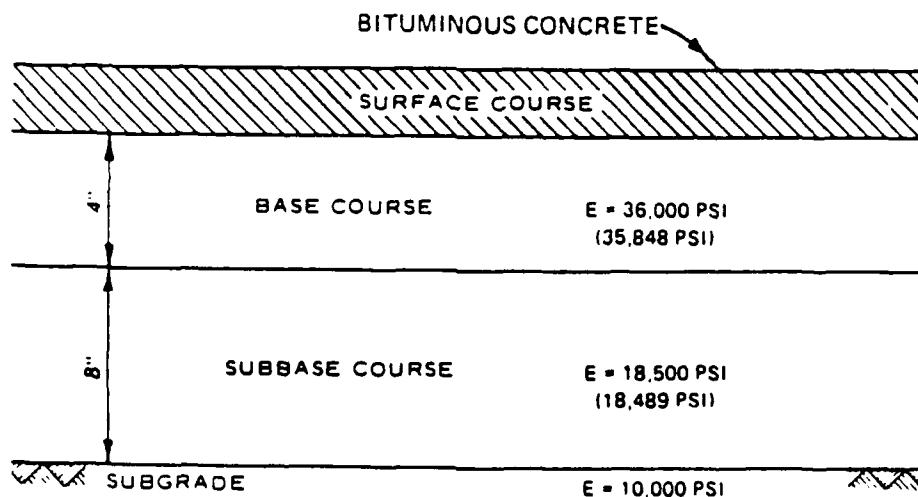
A typical flexible pavement layered system, 8 by 4 ft
